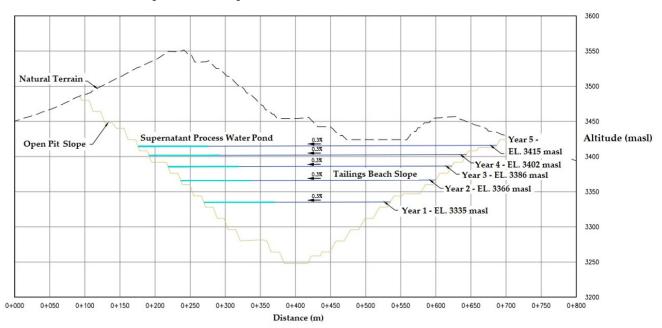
In-pit mine tailings deposition scheme 4 of 4—typical cross section, 2–2′.
